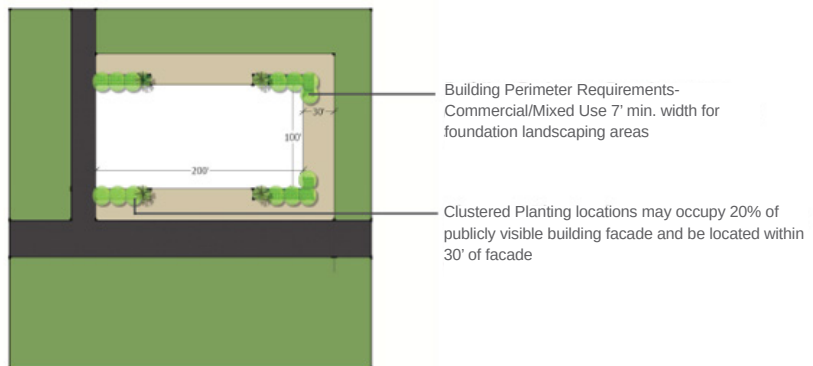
Building Perimeter Landscape Requirements Mixed Use / Commercial
